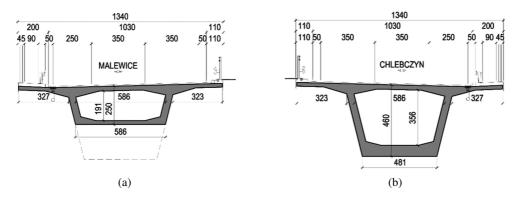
Cross-sections of the MS-5 bridge: (a) span section, (b) support section
